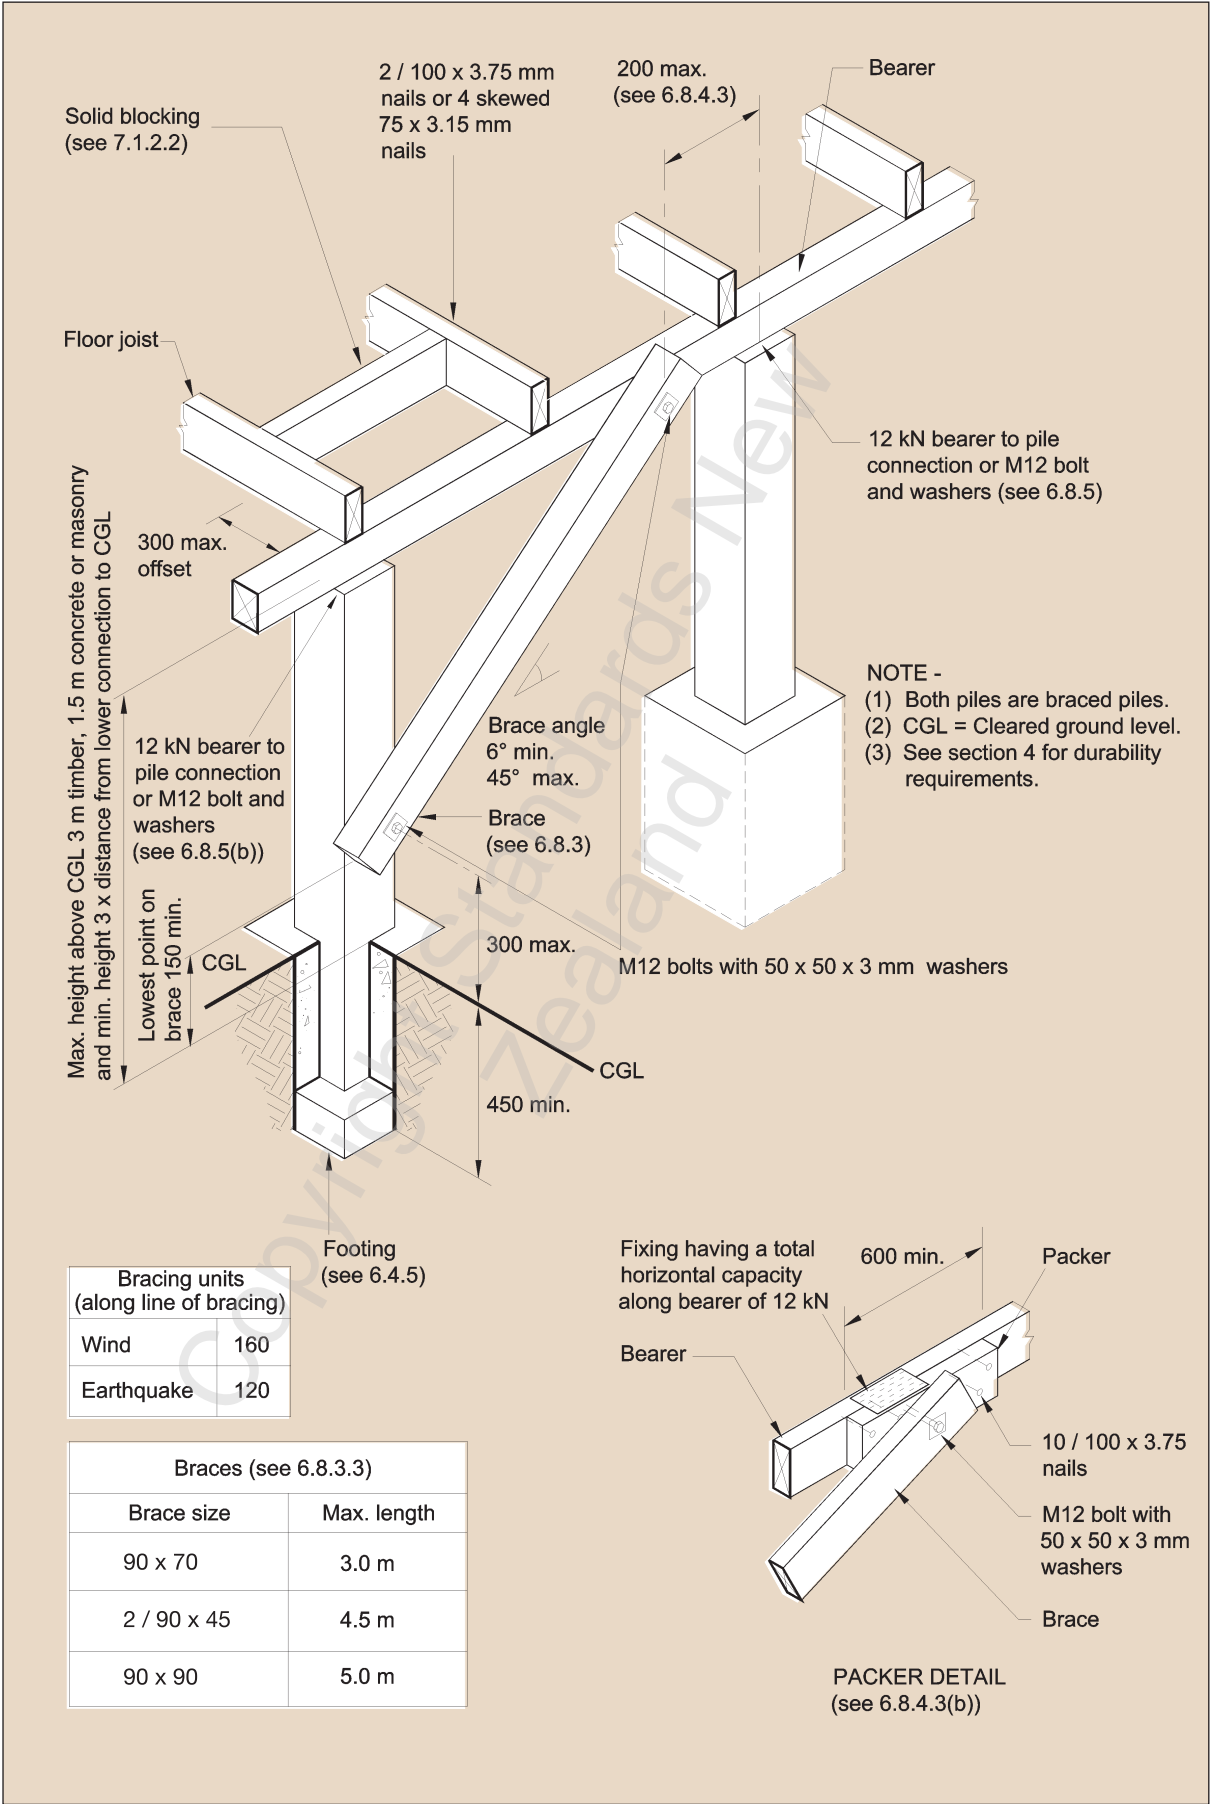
Braced pile system – Brace connected to bearer (see 6.8)
